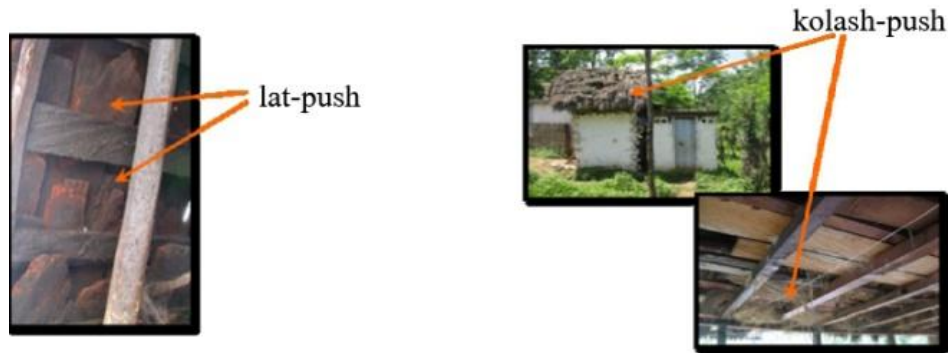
Roof.Detail, Gilan Cultural Heritage.
